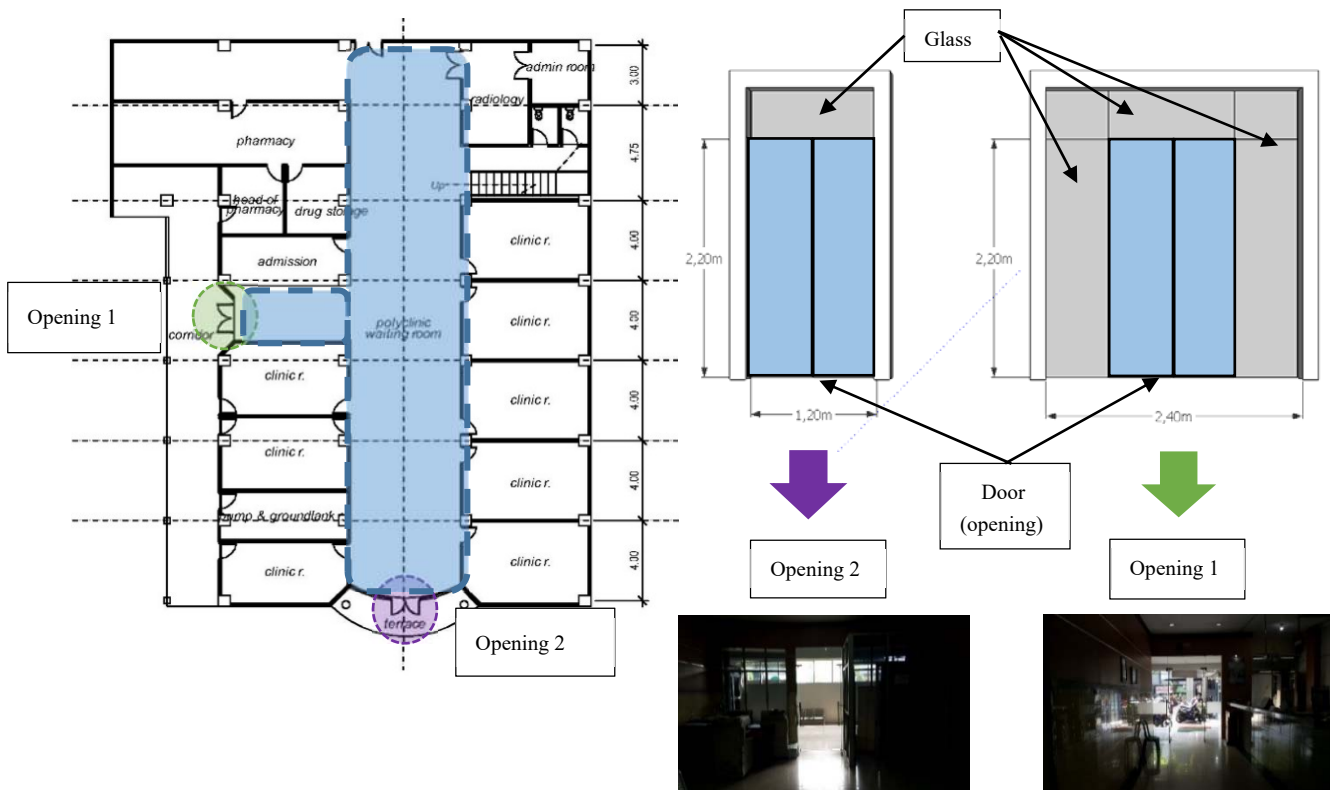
Floor Plan of Polyclinic Waiting Room of Regional Public Hospital (RSUD) in Ungaran with the existing ventilation/opening
